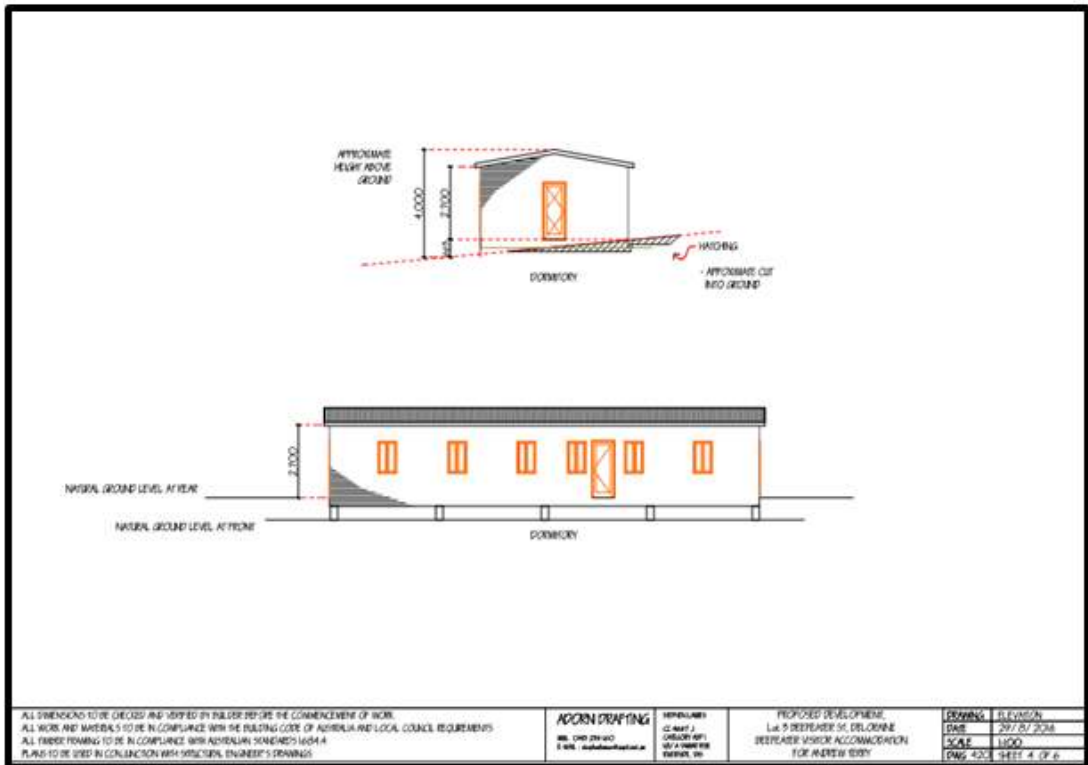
Elevations of dormitory buildings (Adorn Drafting, 2016)
